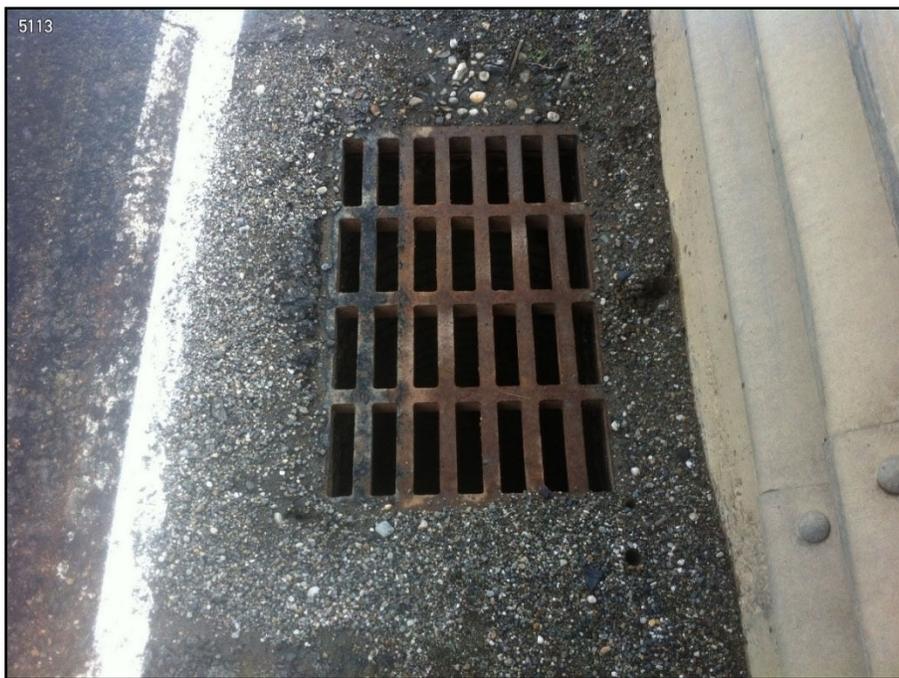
Parks Highway MP 305.4 storm drain catch basin inlet, southbound side of road
